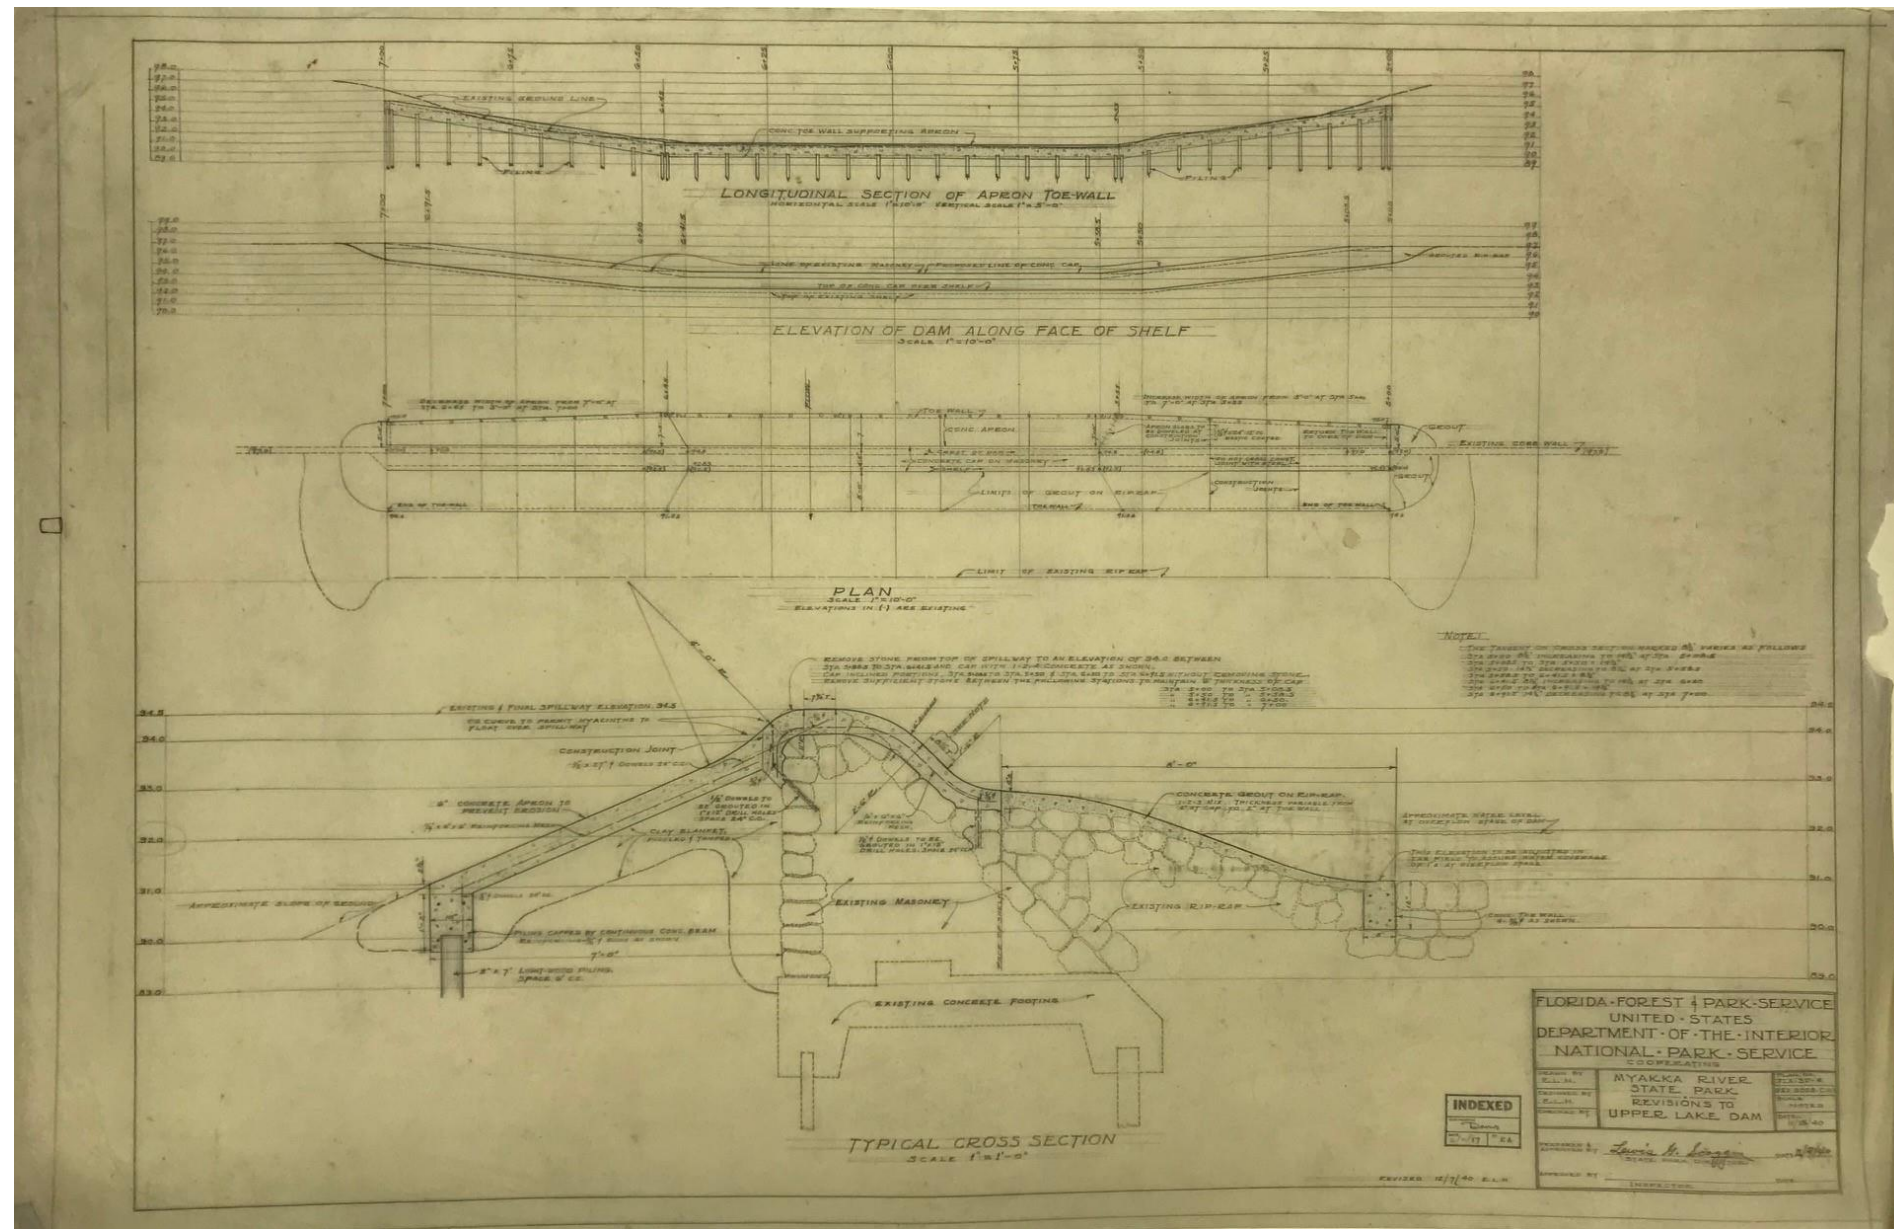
Detailed plans from 1940 revisions to Upper Myakka Dam (8SO2273) on the Upper Myakka Lake, showing typical cross section, longitudinal section of apron toe-wall, and elevation of dam along face of shelf.
